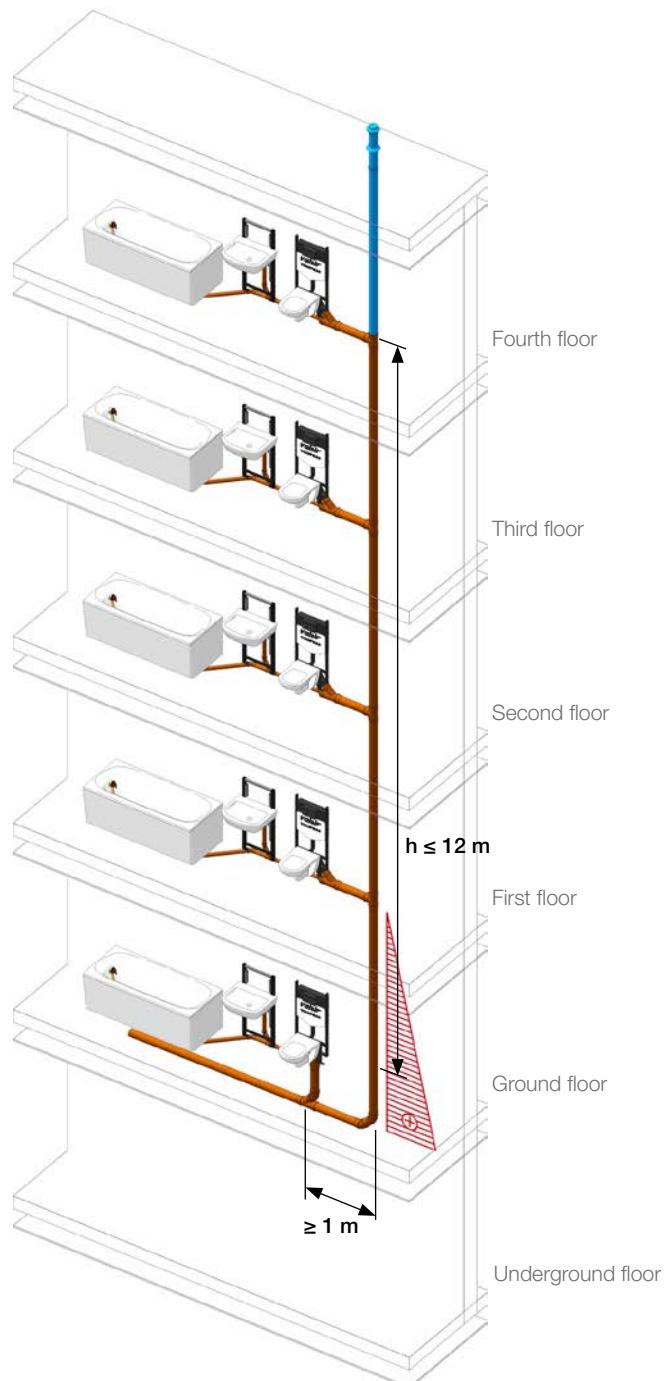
Primary ventilation, 3–5 storey building ($h \leq 12 \text{ m}$), collector on the ceiling of the underground floor.
